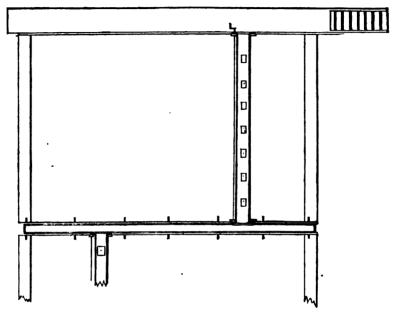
SIDE ELEVATION OF APPARATUS. (Scale: 8 feet to 1 inch.)
